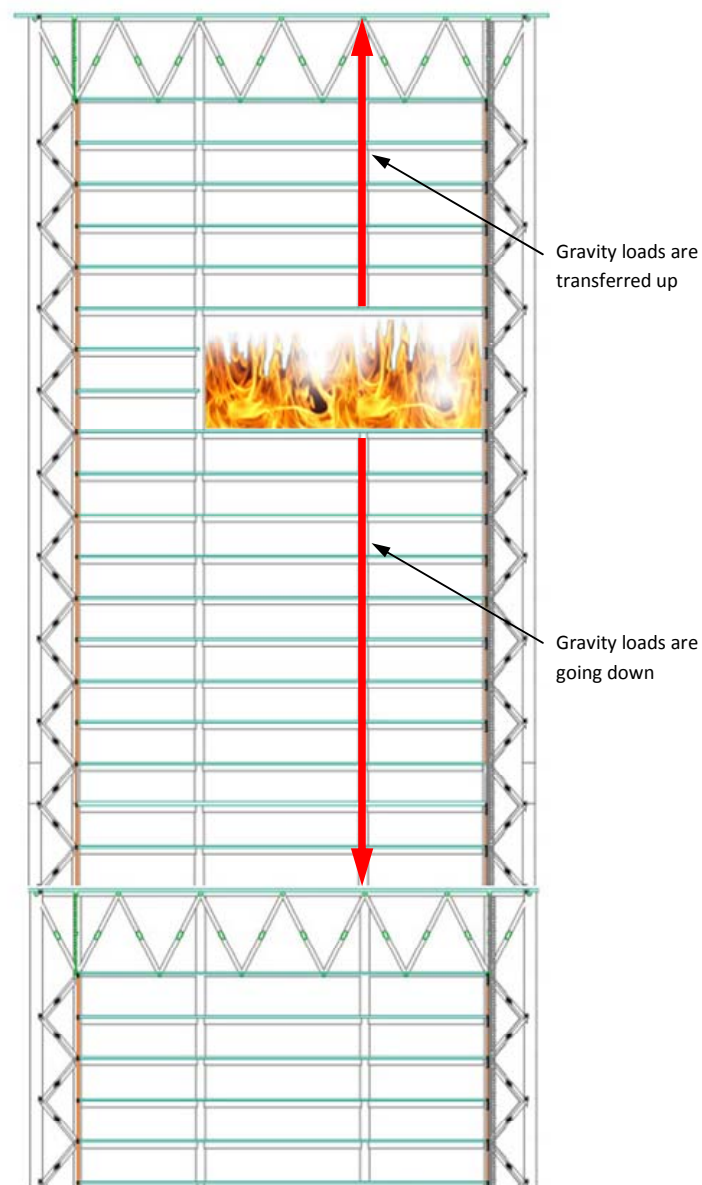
A scenario when two floors collapse. Gravity loads are transferred to the upper and lower horizontal double-layer space structures
